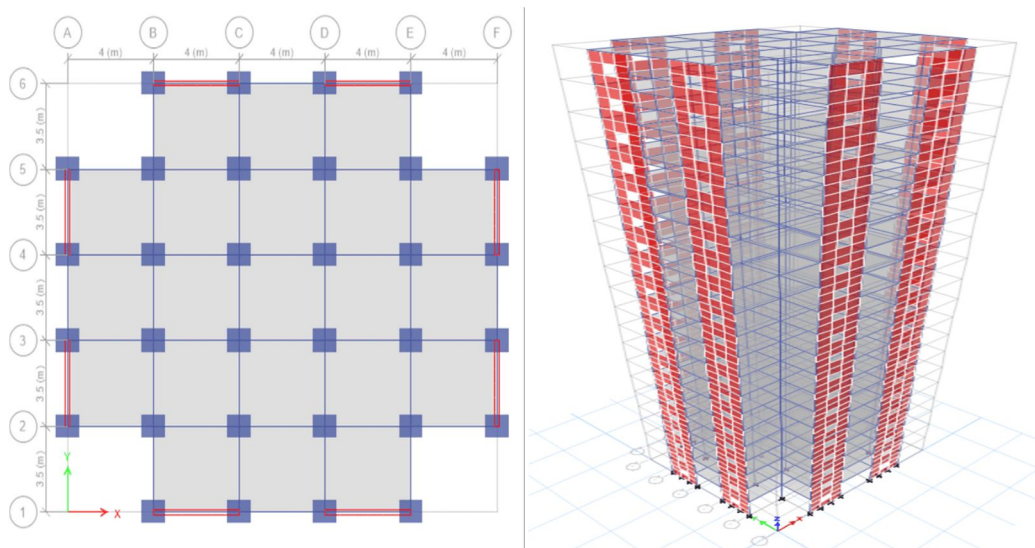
Plan and 3D view of Irregular building with shear wall openings at corners on each side
